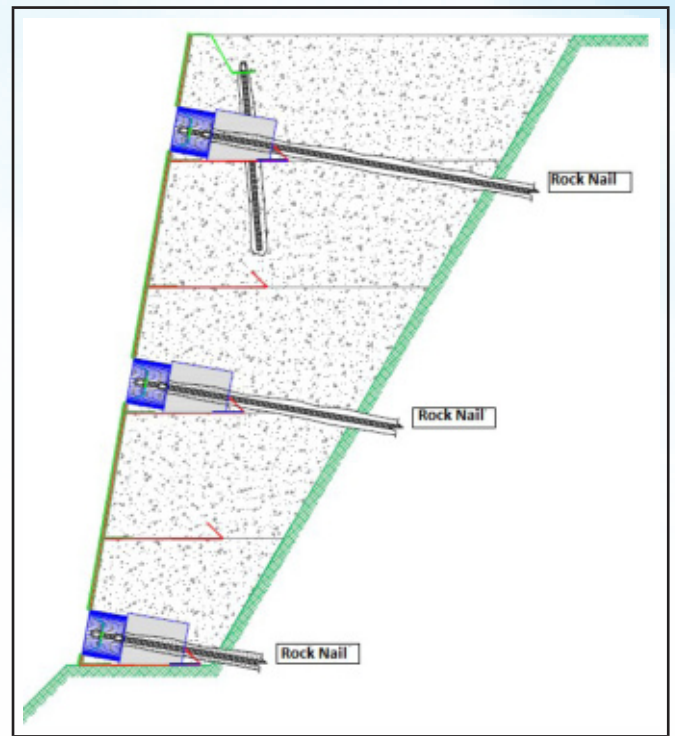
Proposed protection works to reinstate the failed rock slope with the use of self-drilling anchors and steel mesh facing and backfilling. The rock nails should have at least 3 m embedment in the bedrock.
